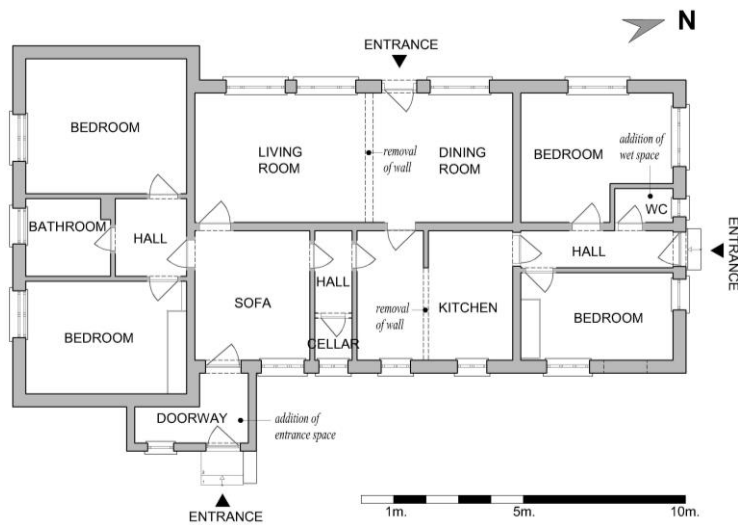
Ground floor plan of Employee Dwelling Type 4
